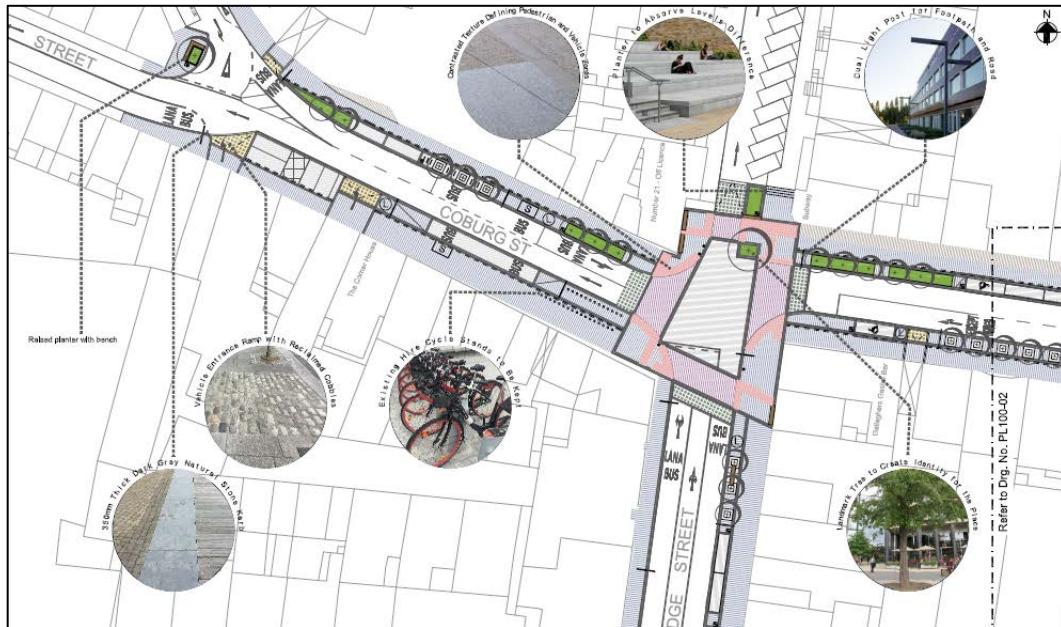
Public realm proposals for Coburg Street and Bridge Street | Not to Scale
